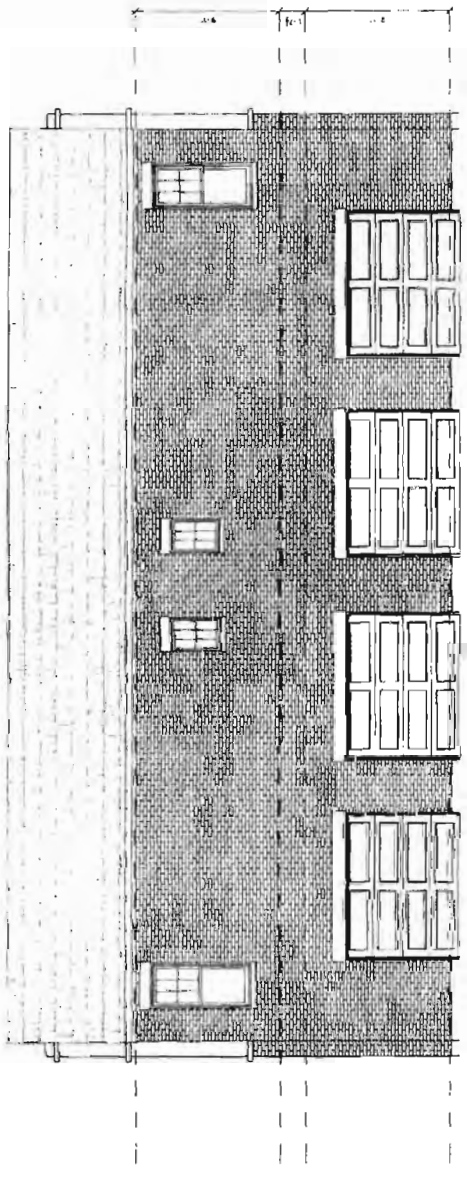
CARRIAGE HOUSE SIDE ELEVATION
